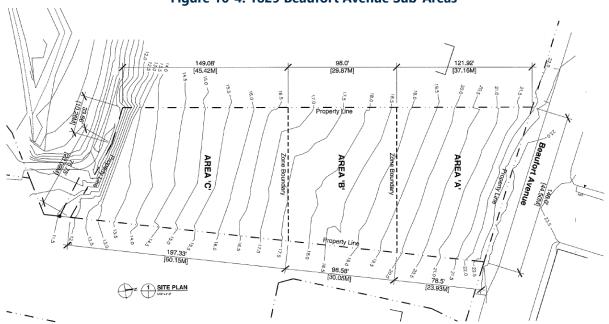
1829 Beaufort Avenue Sub-Areas
